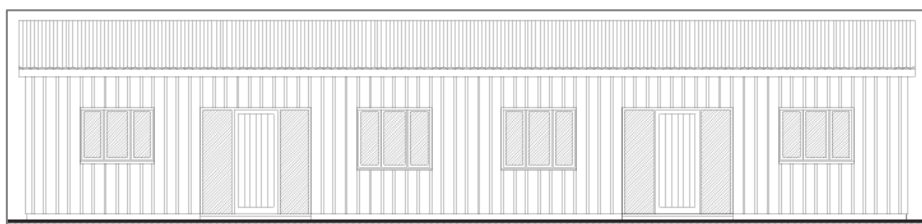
Approved south east elevation (24/01837/PNACOU)
